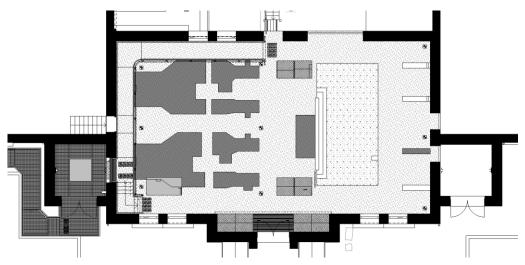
Proposed concrete floor slab within CHEH Engine Room – Refer Architectural Documentation for full design notes.
